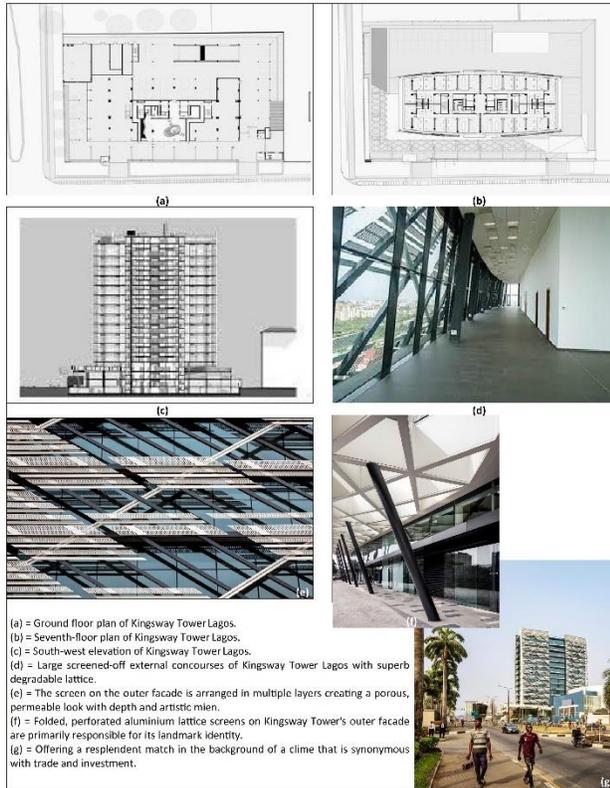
(a) = Ground floor plan of Kingsway Tower Lagos; (b) = Seventh-floor plan of Kingsway Tower Lagos; (c) = South-west elevation of Kingsway Tower Lagos; (d) = Large screened-off external concourses of Kingsway Tower Lagos with superb degradable lattice; (e) = The screen on the outer facade is arranged in multiple layers creating a porous, permeable look with depth and artistic mien; (f) = Folded, perforated aluminium lattice screens on Kingsway Tower's outer facade are primarily responsible for its landmark identity; (g) = Offering a resplendent match in the background of a clime that is synonymous with trade and investment. *Source: Authors' Fieldwork.
